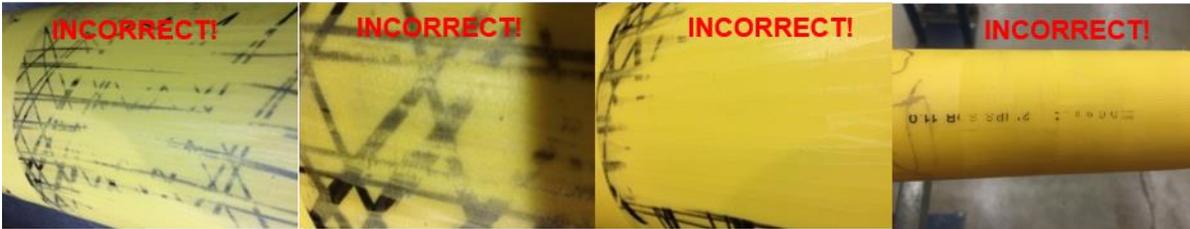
Figure X-p - Incorrect Scraping! Improper surface preparation / Not enough material removed, marks still visible.
